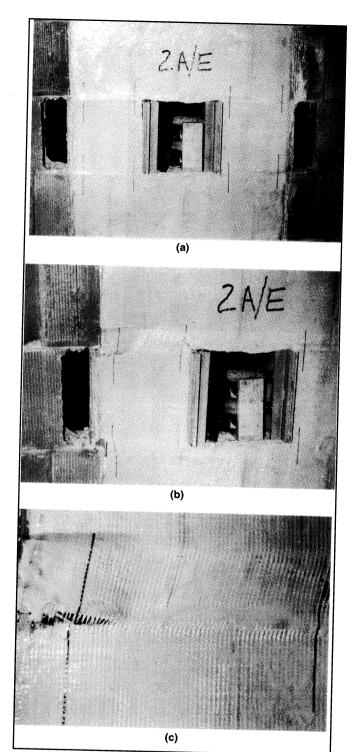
In-situ shear tests of hollow clay tile walls in San Francisco City Hall Building: a) test setup; b) at maximum load; c) at conclusion of the test
